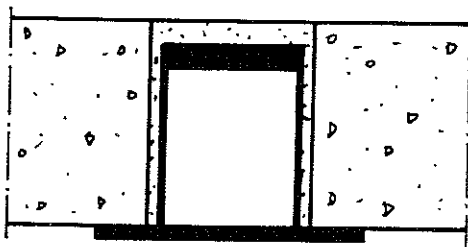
a. Floor girder partially built into, and insulated by, the floor slab
